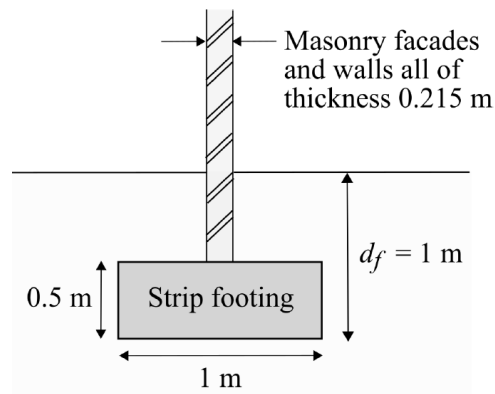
Detail of masonry and foundation (Yiu et al. 2017).
